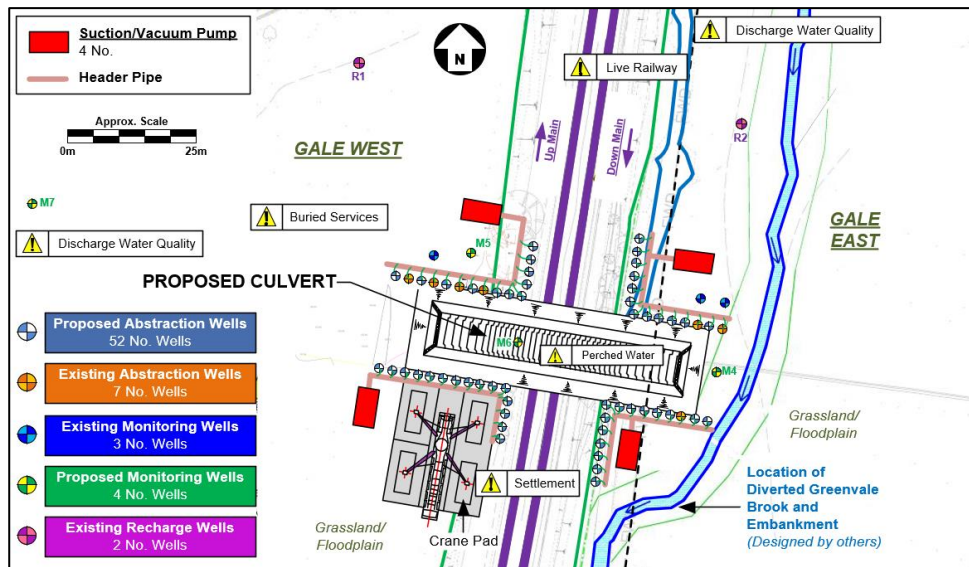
Site plan showing well locations and dewatering system pumping set up at the site.
